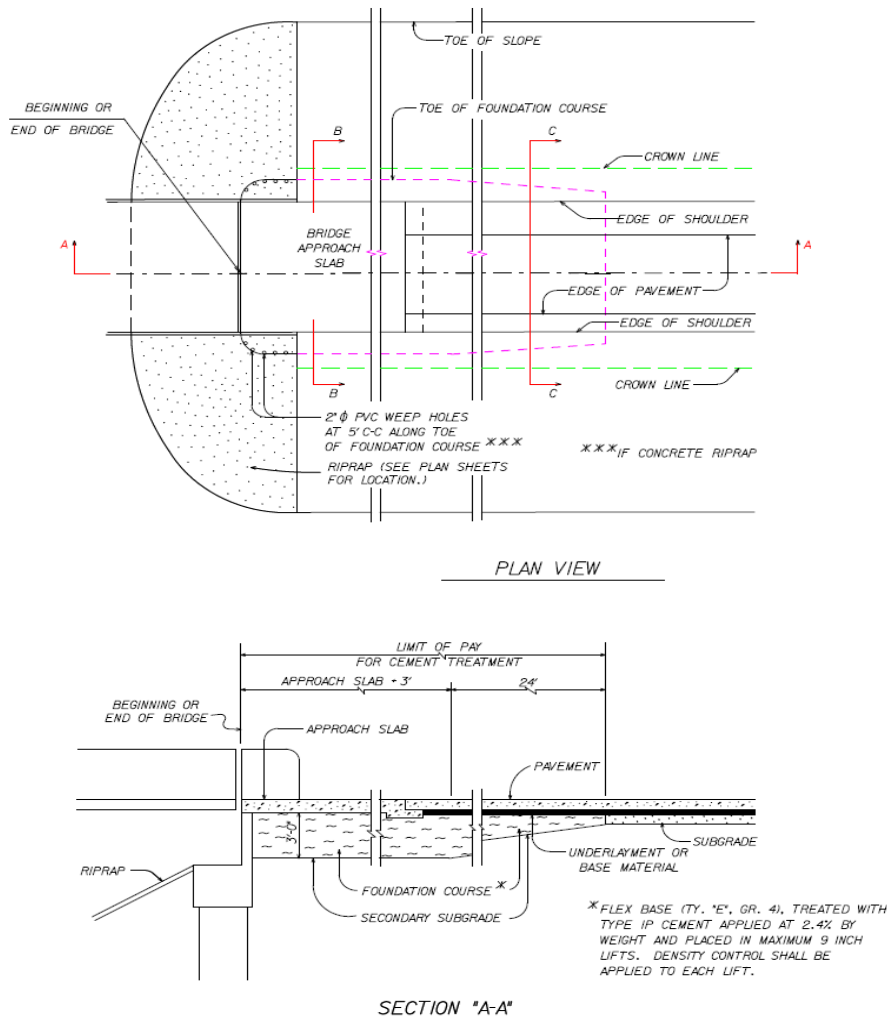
Schematic of Bridge Approach Slab Arrangement Adopted by the Fort Worth District of TxDOT, Texas
